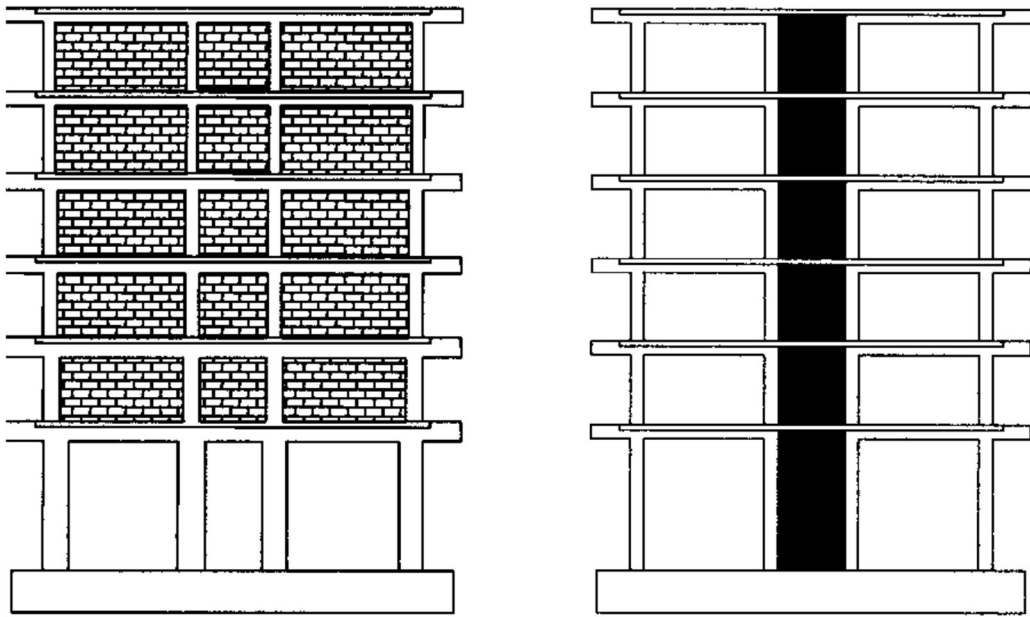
Reinforce concrete frame with infill walls (Lu, 2002)
